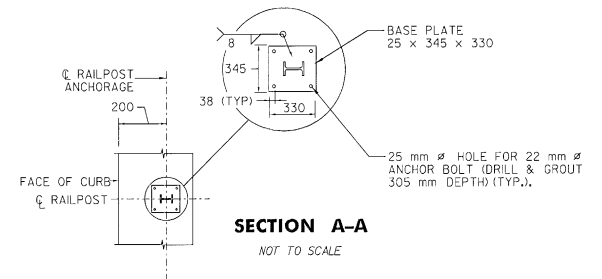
DETAIL OF STEEL BEAM GUARDRAIL AT
